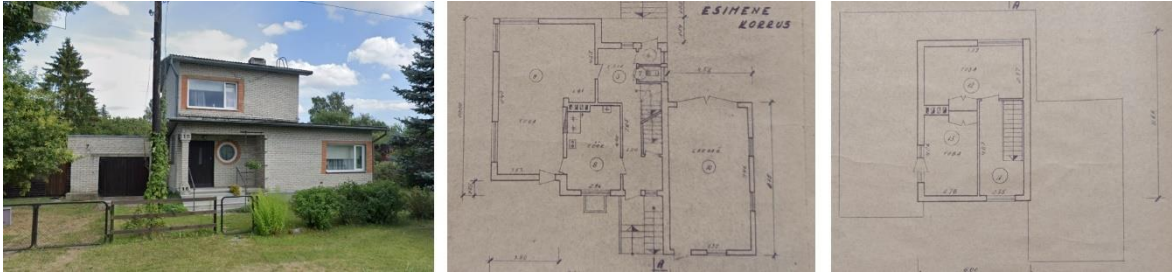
Lõuna 3 (1970) in Väike-Maarja (left to right: view, ground floor layout and upper floor layout)
